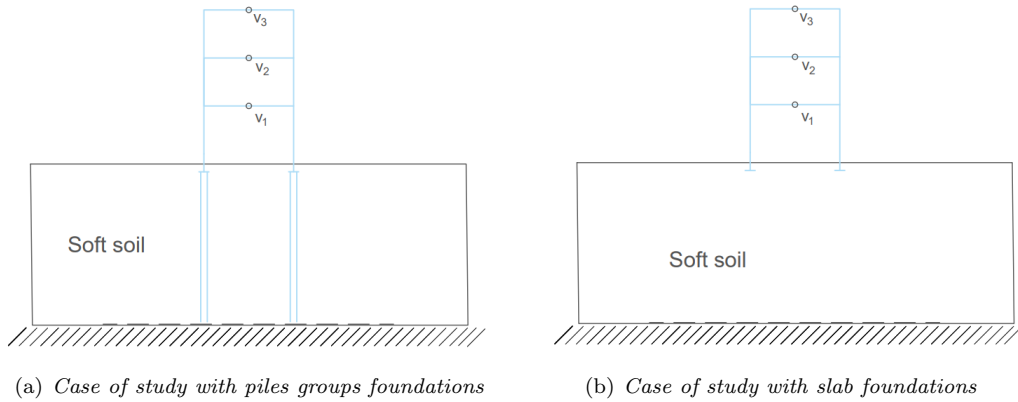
Cases of study taken into account; piles group foundations (a) and slab foundations (b)
